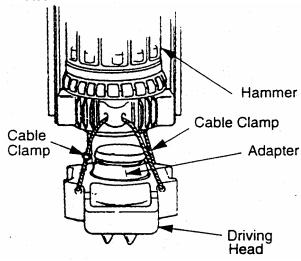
Hammer, Adapter, and Driving Head Assembly.
